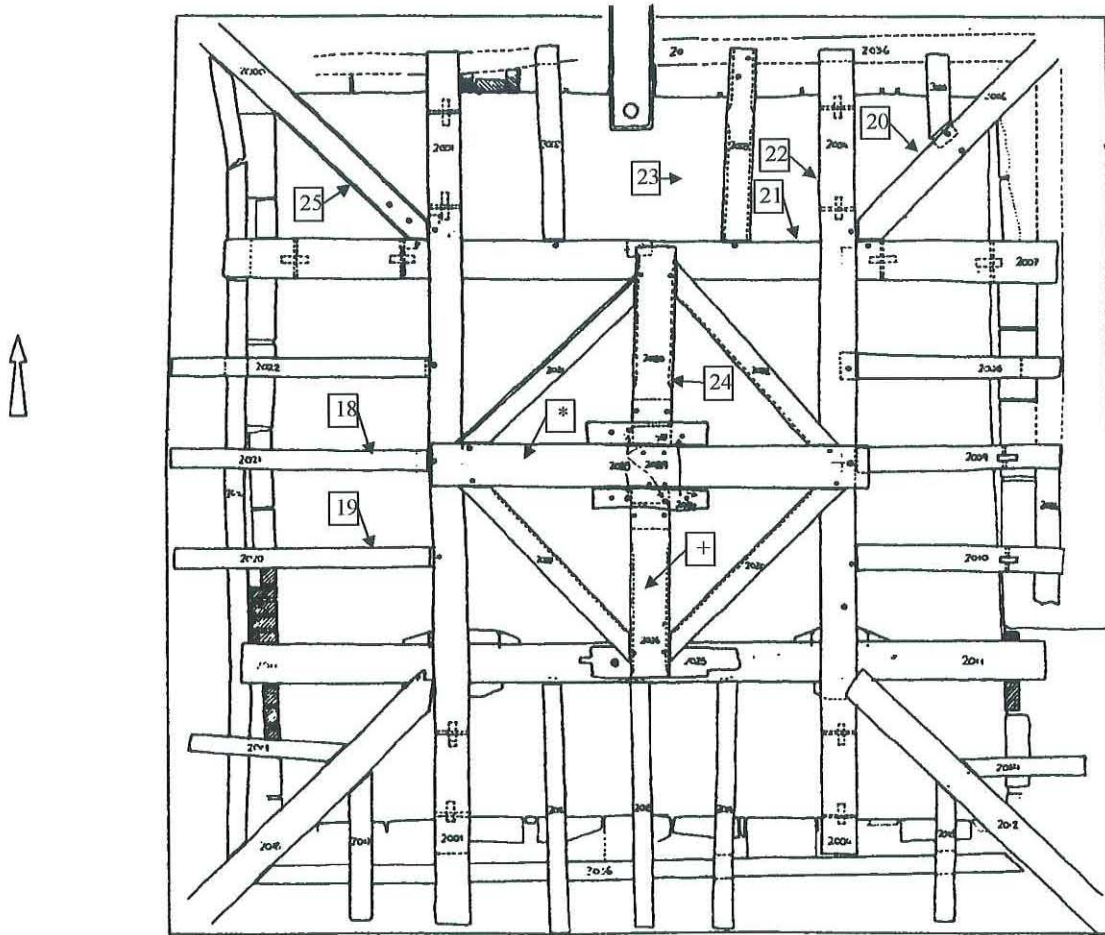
Plan of the roof beams, showing approximate locations of the roof and corbel samples (after Caroline Atkins pers comm)
